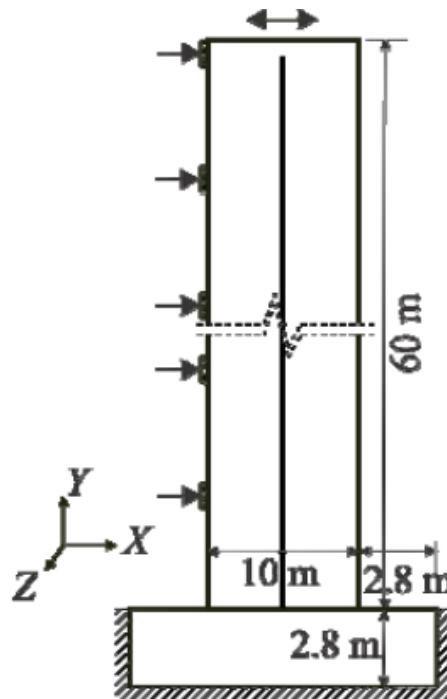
Loading and boundary conditions of the slit wall (Baetu, 2012)
